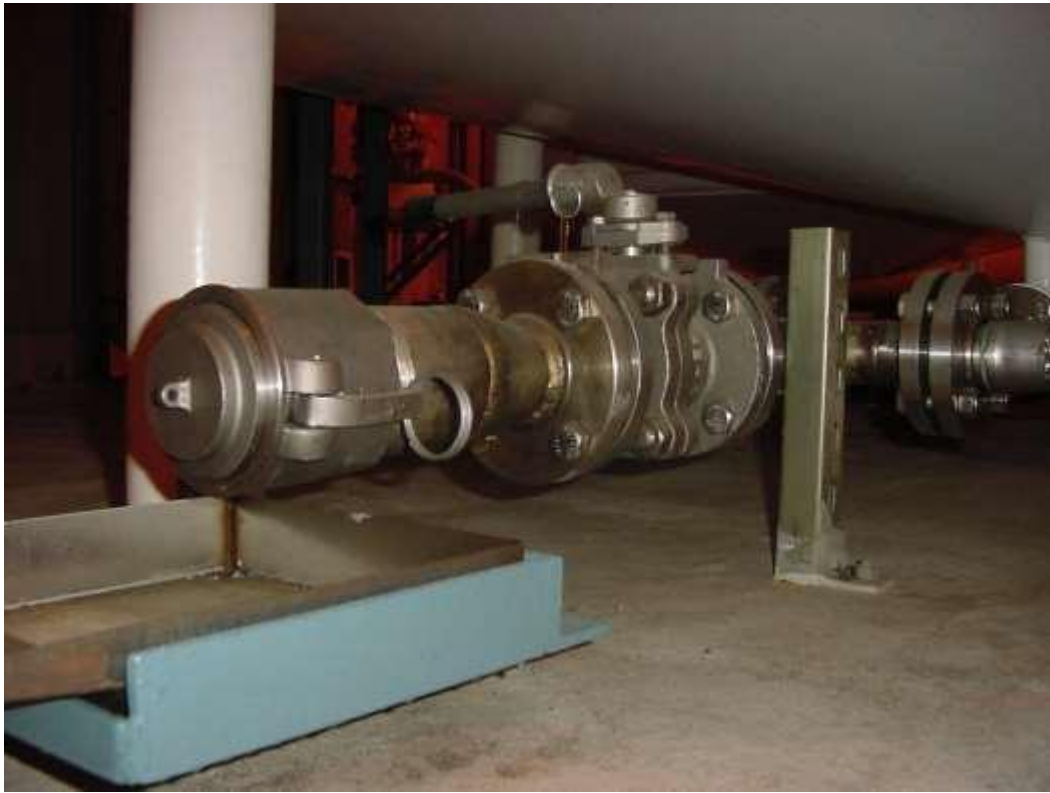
Backflush drain valve COV-1 and drain cap COD-1. Test perimeter of flanges at either end of valve, valve center flange, valve stem seal, and perimeter of end cap.
